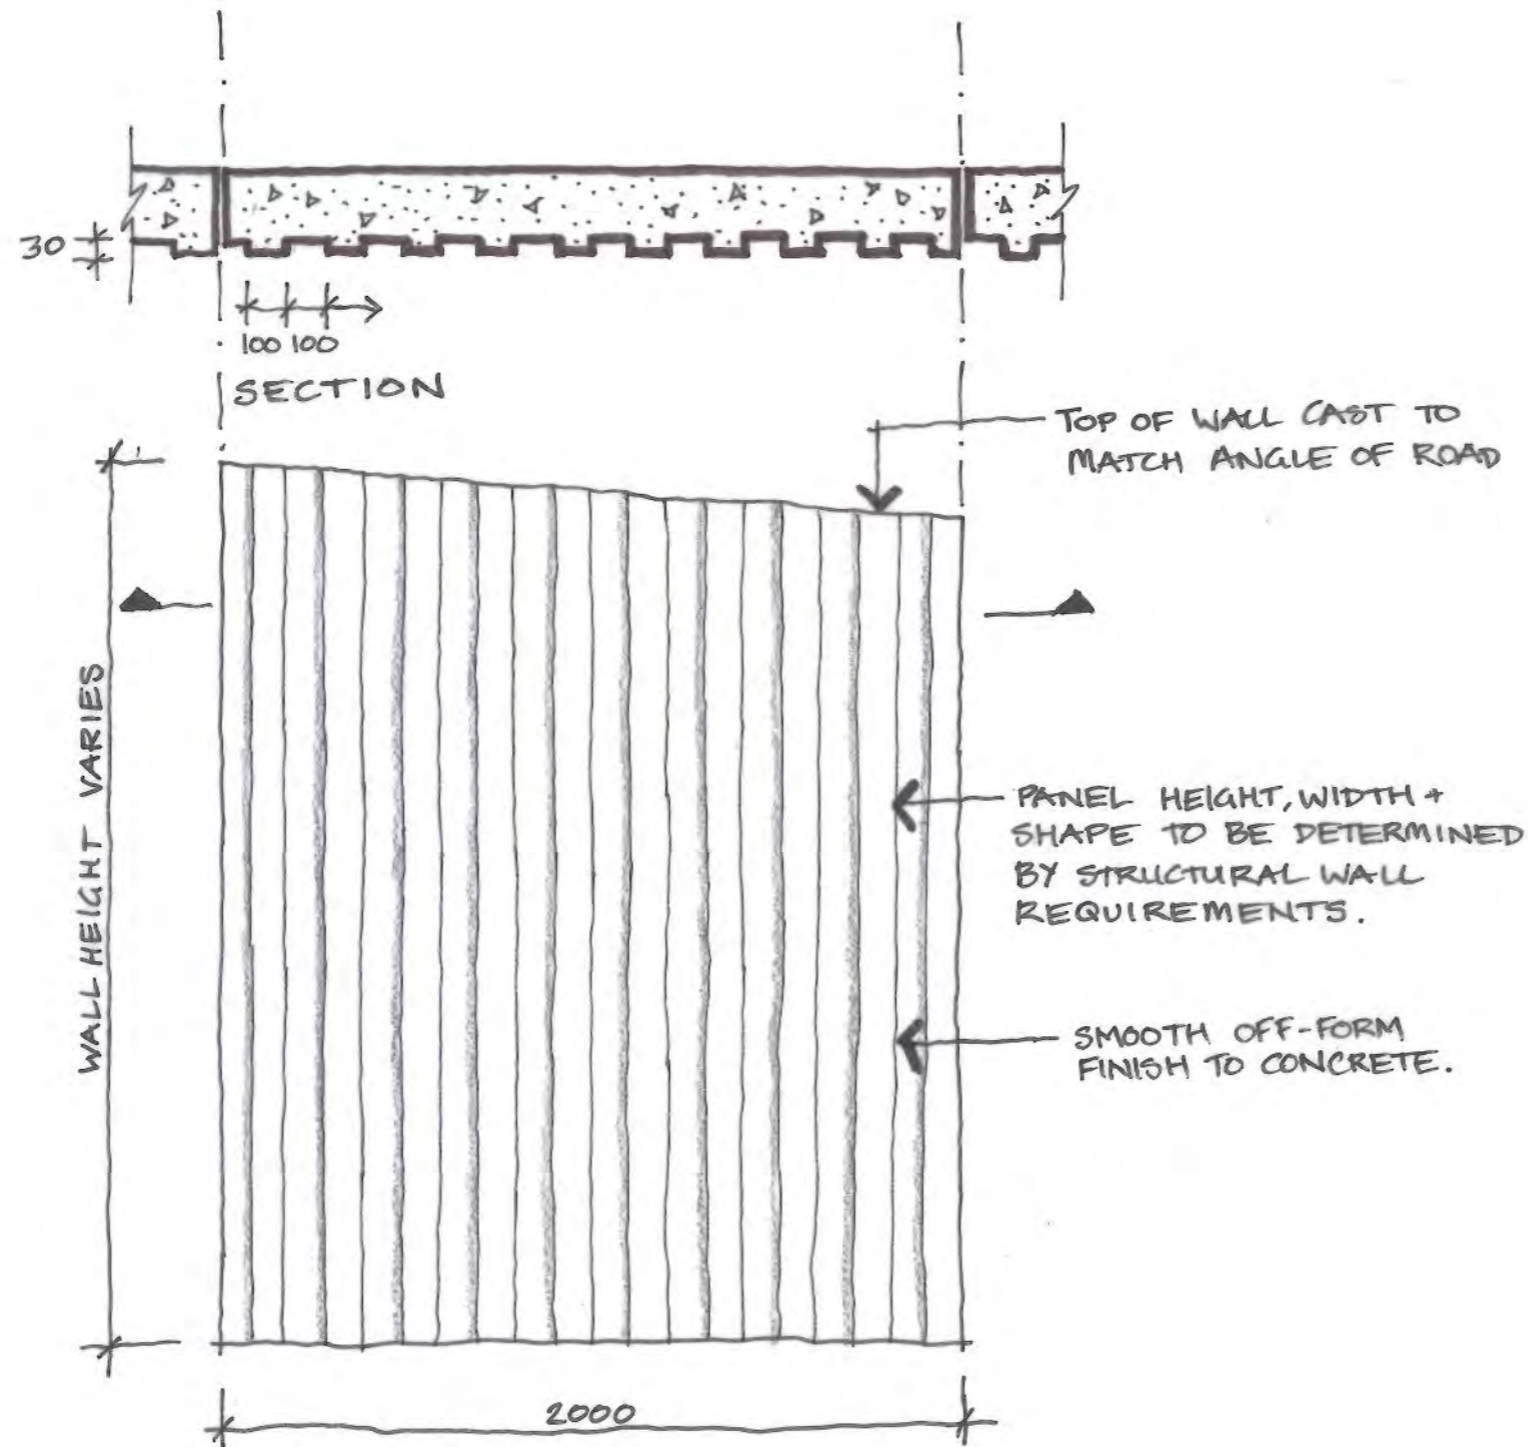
Type A Retaining Wall Section and Elevation Detail
